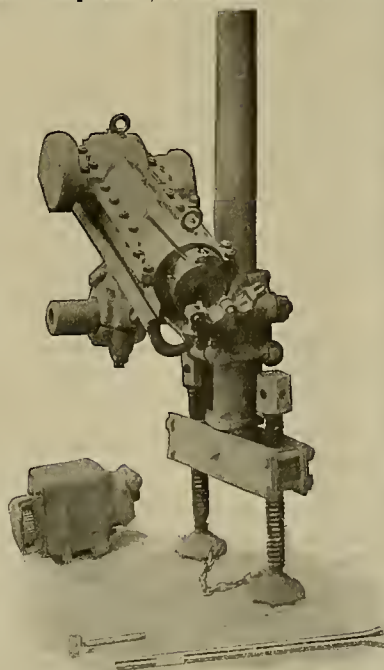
Box Electric Rock Drill, With Motor Removed.
